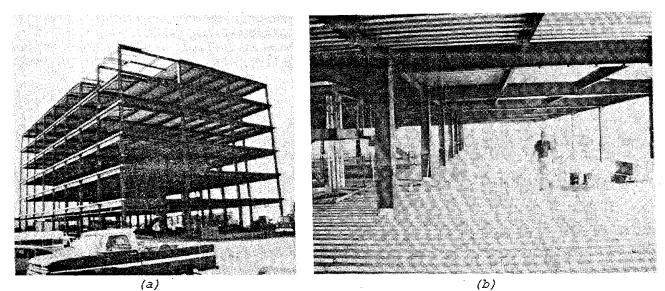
Building with complete ductile moment frame system. All columns in single flexure.
